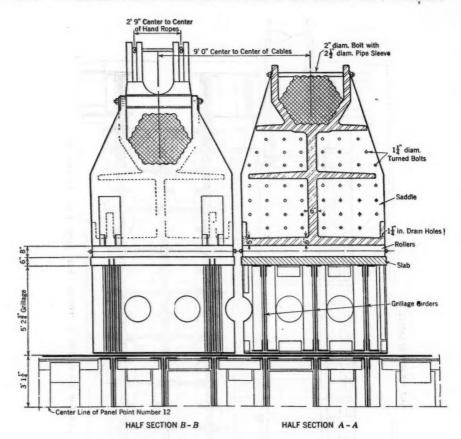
ELEVATION, TOP OF TOWER (SEE, ALSO, FIGS, 15 AND 16).
